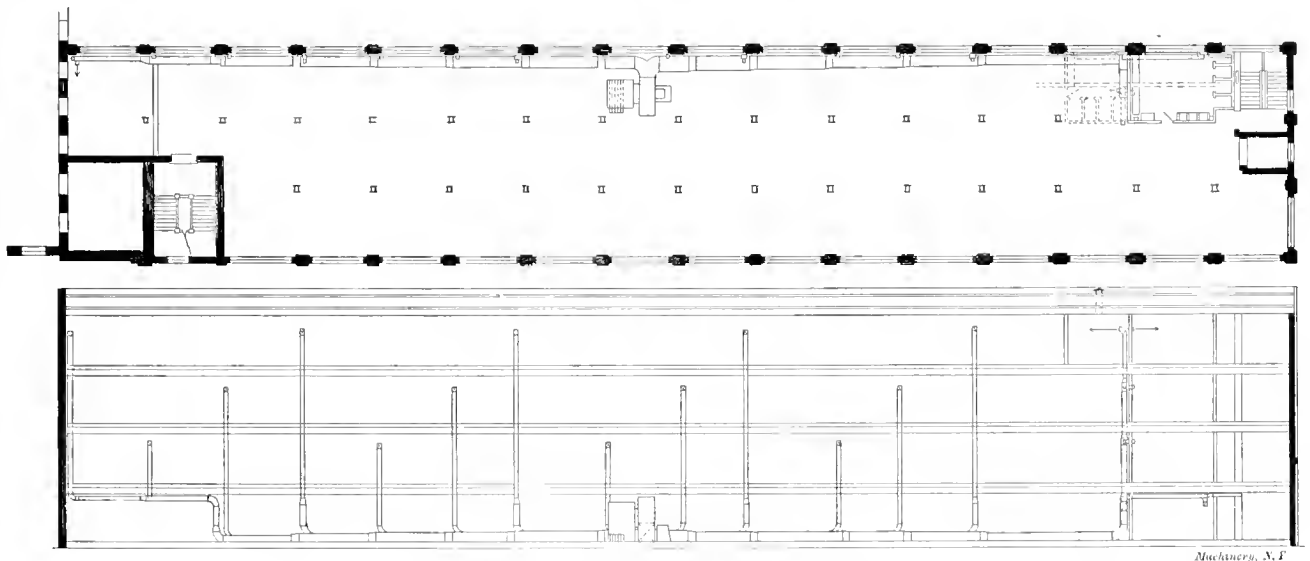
Heating and Ventilating System of the Ashcroft Manufacturing Company, Bridgeport, Conn.
